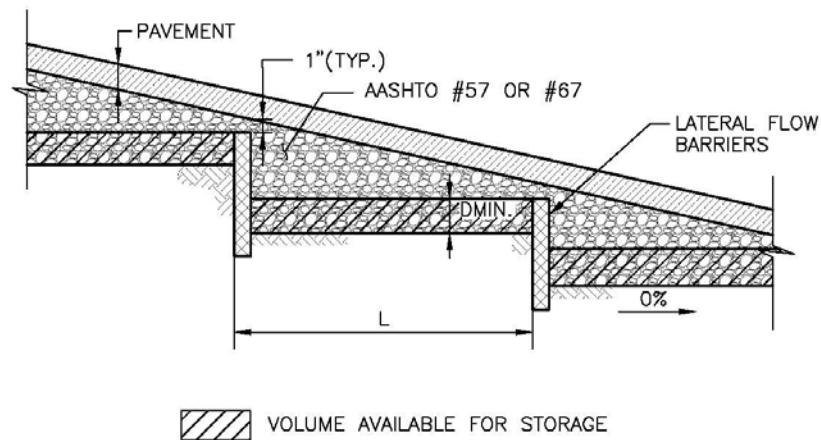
Permeable Pavement Profile, Stepped Installation
